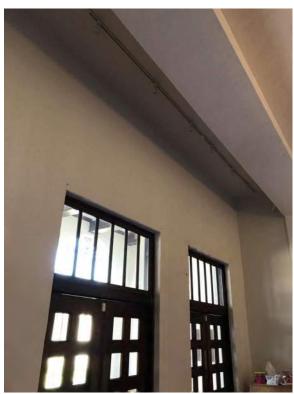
Sample Missing Exit Sign/Emergency Fixture
